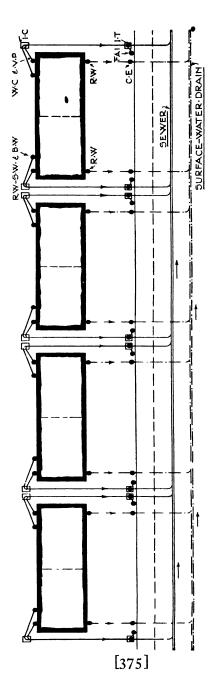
Plan of drainage for eight houses with separate sewage and surface-water drains for each house. Surface water at rear discharging into sewage drain.
